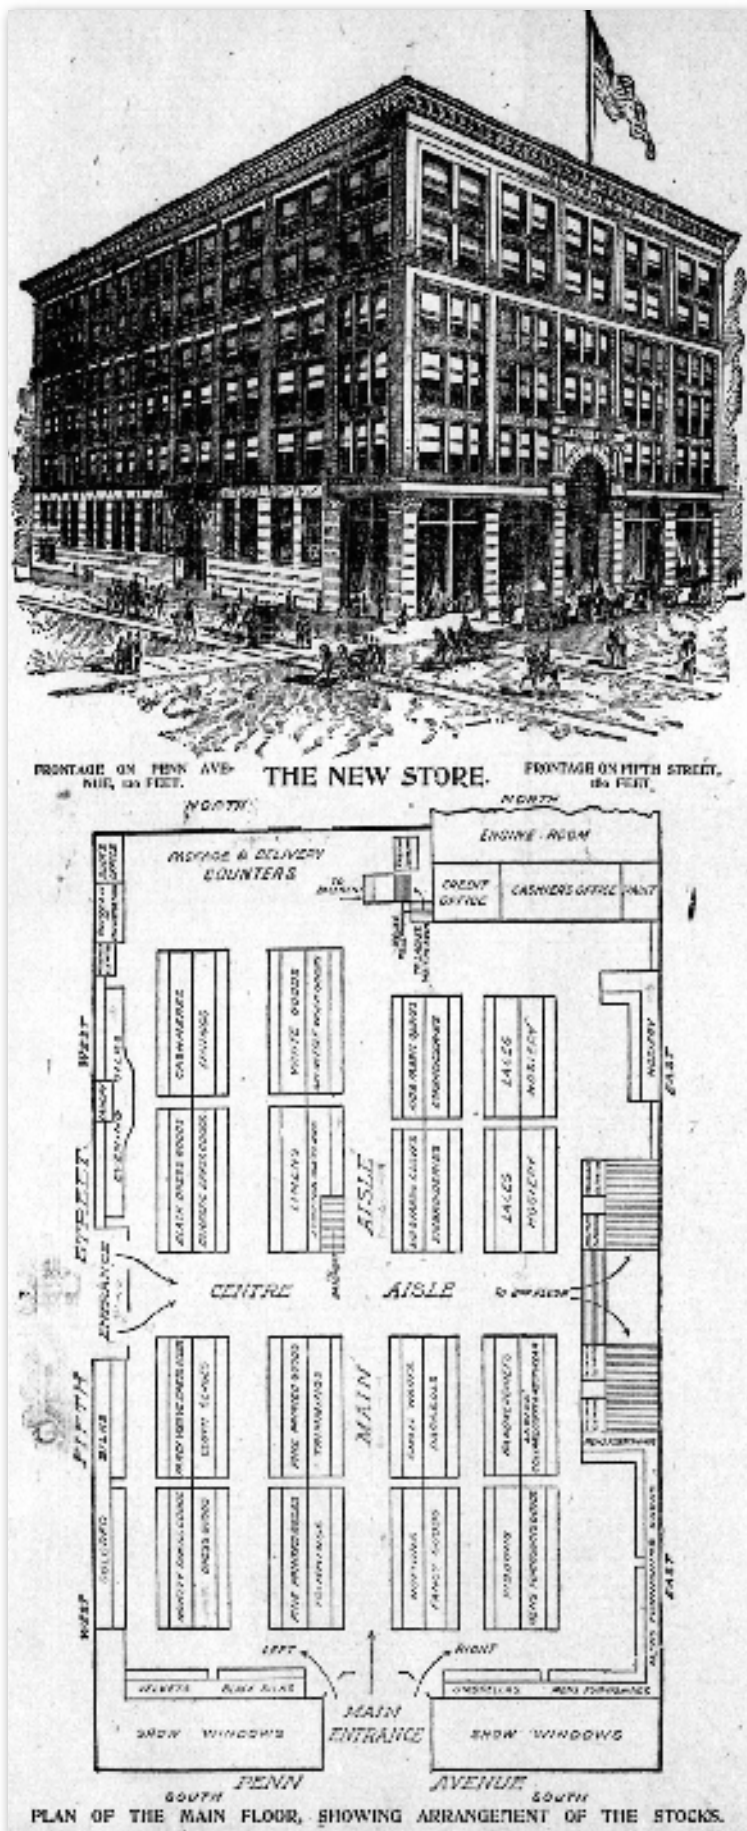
(left). Drawing and first floor plan from the opening of the Joseph Horne Store, *The Pittsburgh Press*, 31 July 1893.
